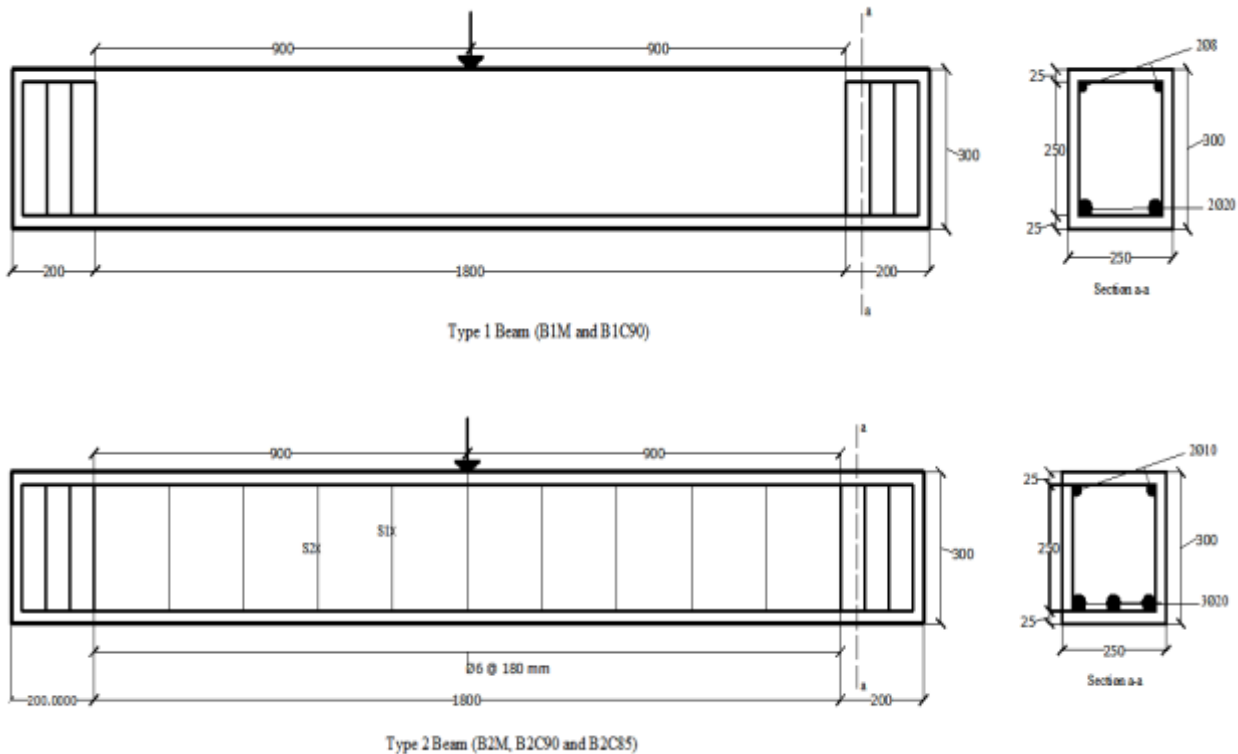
Typical beam (Type 1 and Type 2) layout and strain gauge arrangement
